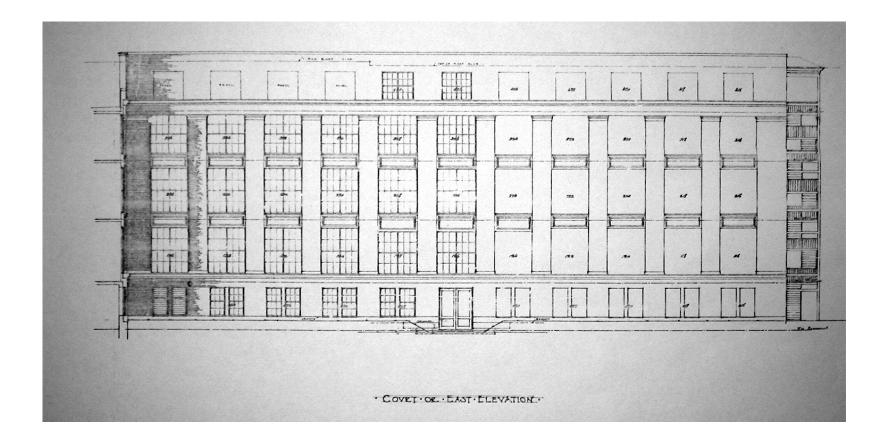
Photo of the East Elevation of the Pratt School of Naval Architecture.
